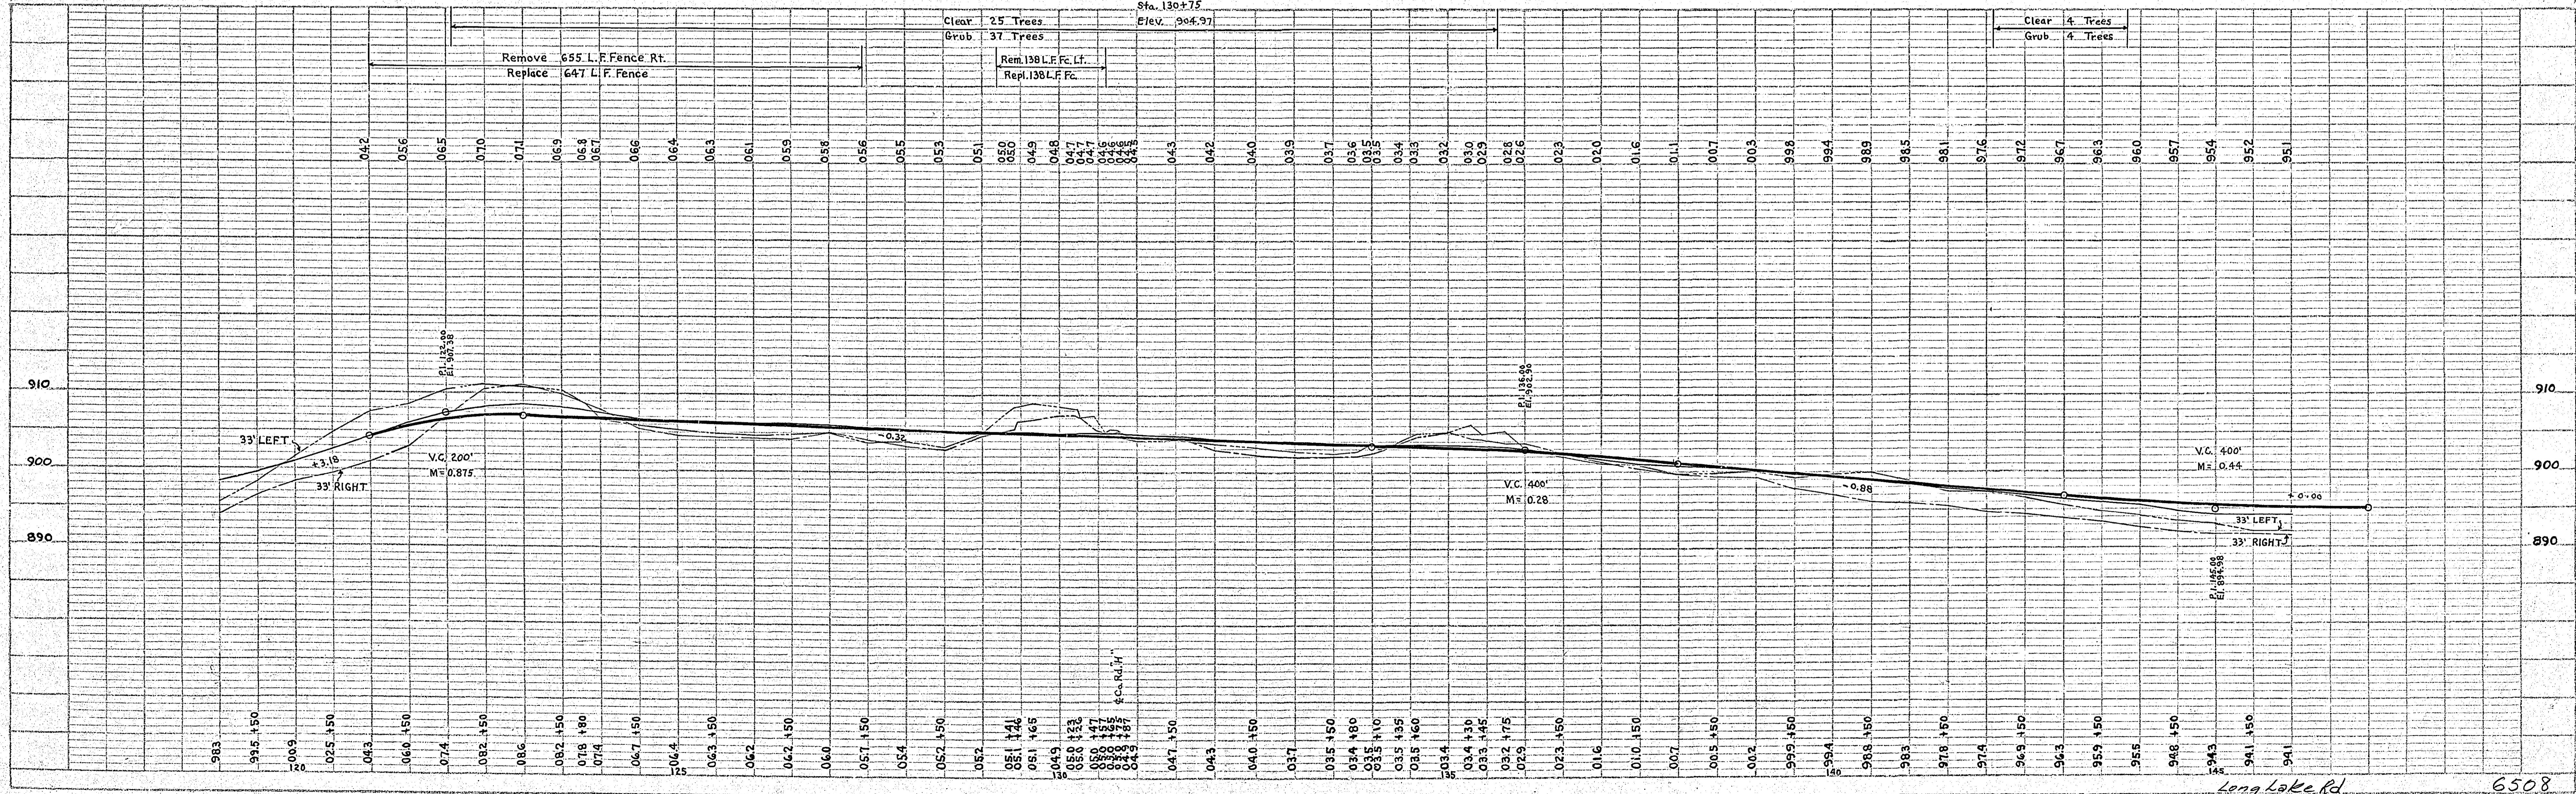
PLAN - PROFILE OF R.R. & R.E. STANDARD
